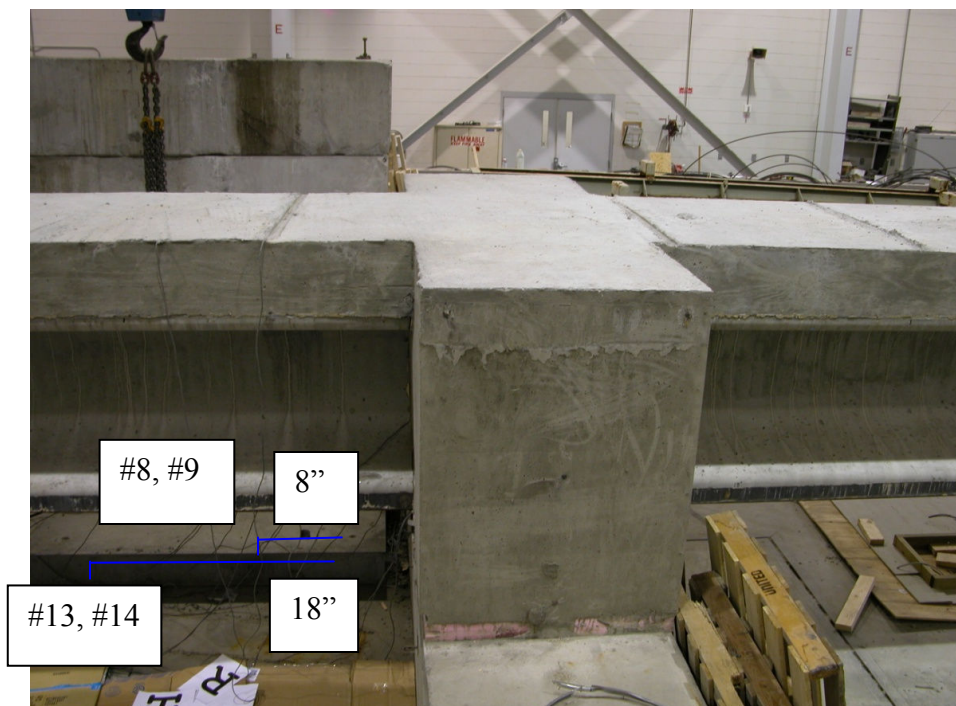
Strain Gages on the Girder Bottom Flange
